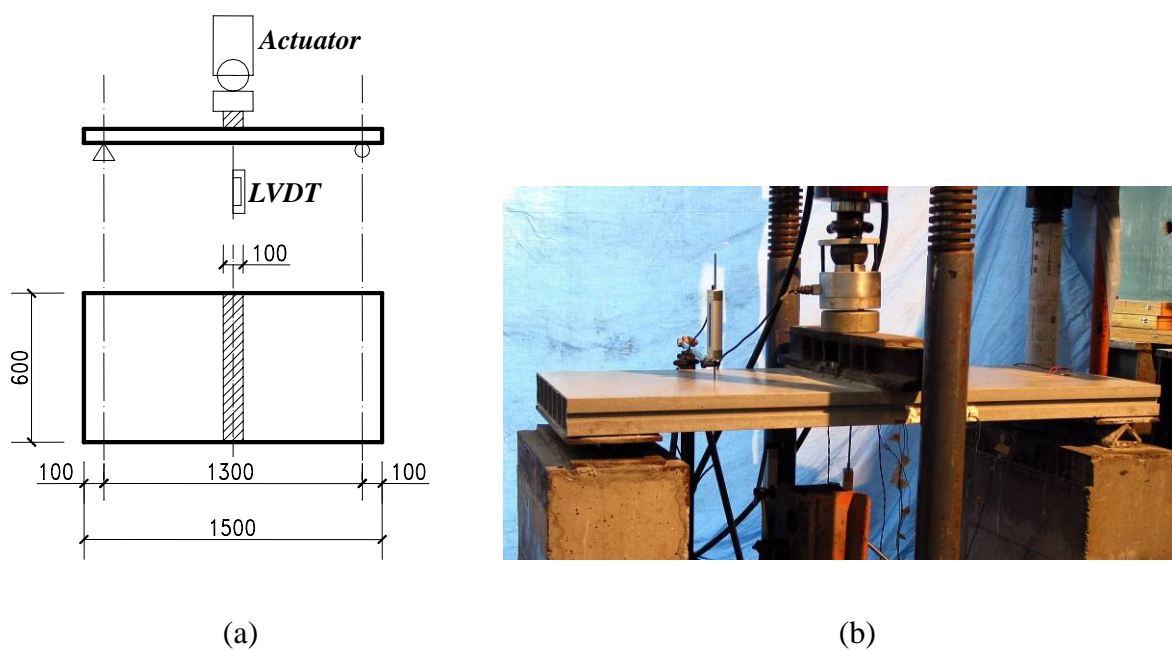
Failure loading test: (a) illustration of test (unit: mm) (b) test setup
